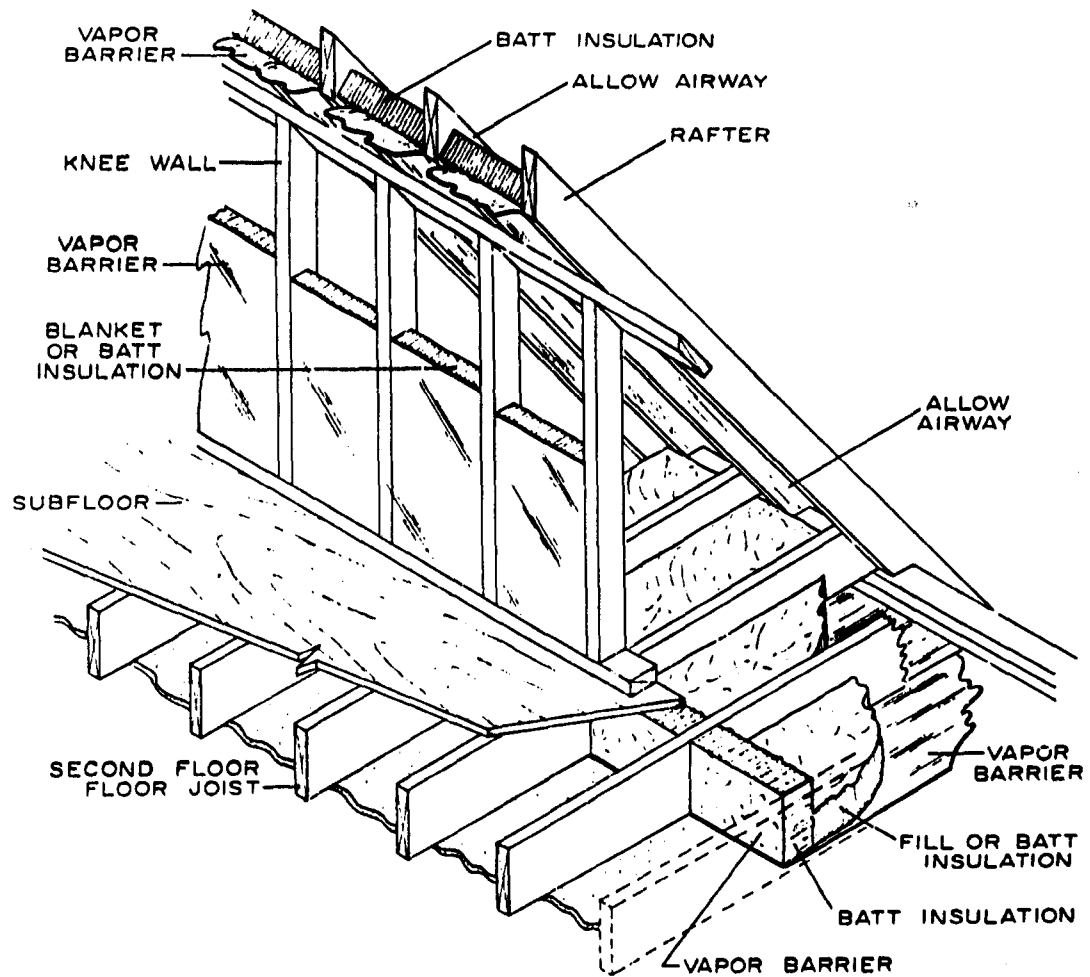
Installing vapor barrier and insulation in knee-wall areas of 1-1/2-story house. M 139 232
